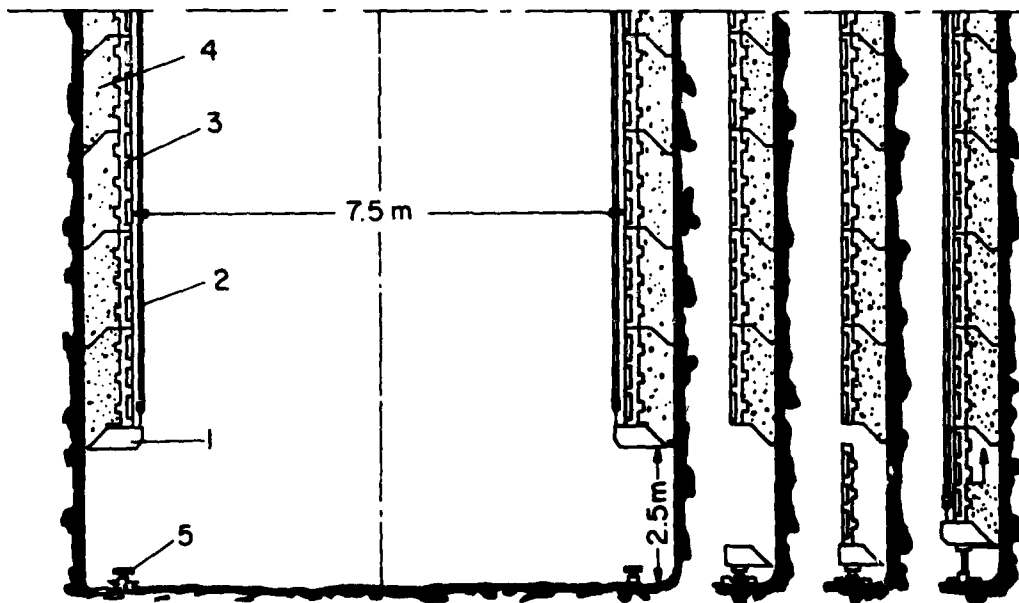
Underhanging system of tubing lining installation. I, II, III, IV - consecutive phases of construction. 1. Installation ring, 2. Cables supporting assemble ring, 3. tubings, 4. concrete (back filling), 5. hydraulic jacks supporting assemble rings.
